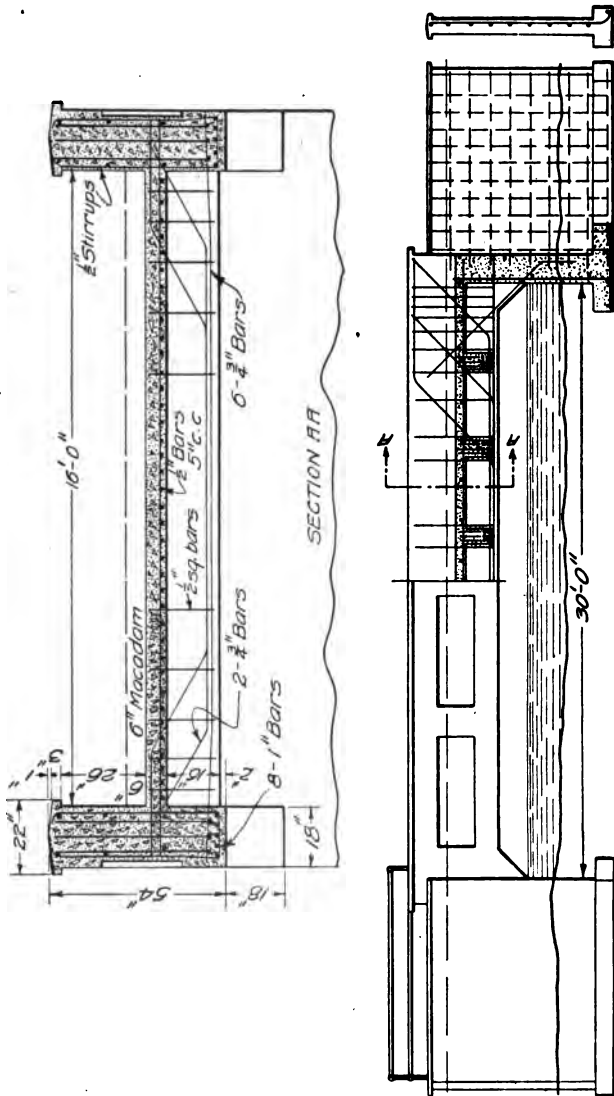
Details of Girder Bridge near Allentown, Pennsylvania
